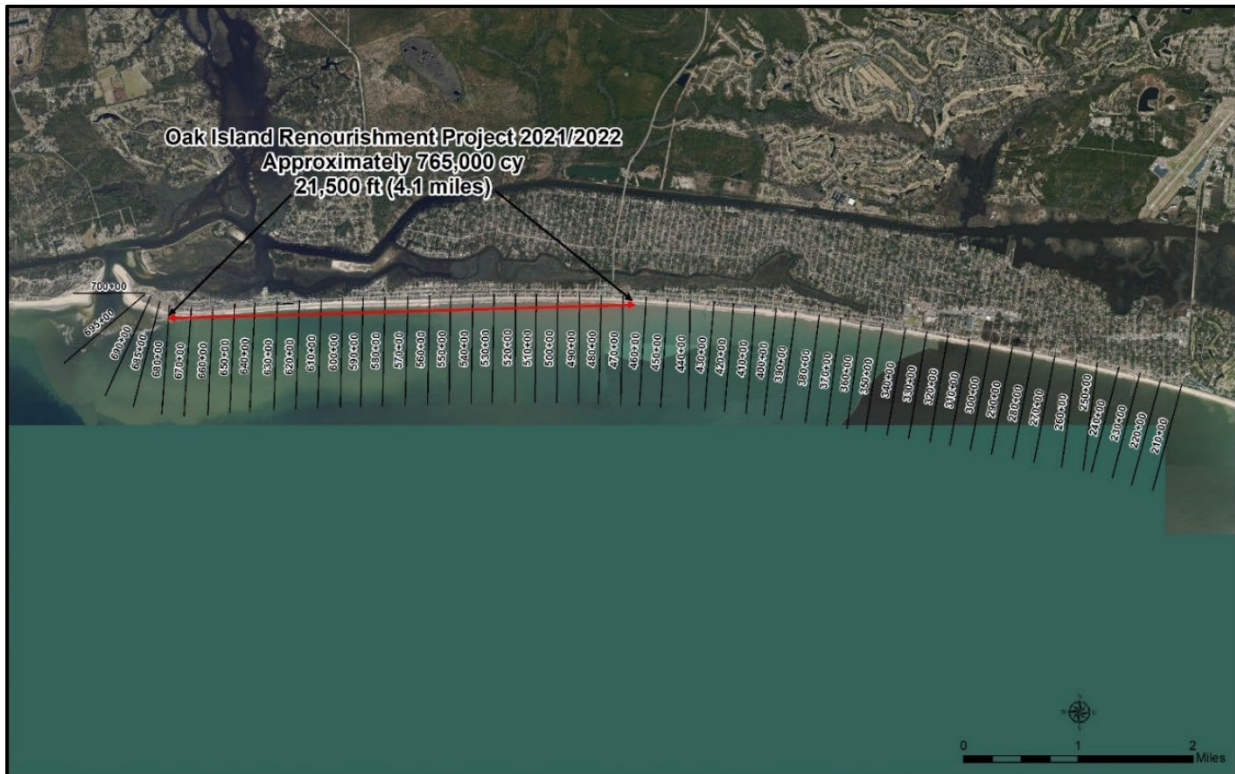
2021/2022 Oak Island Renourishment Project Beach Fill Extent (Sta 465+00 to Sta 680+00)
